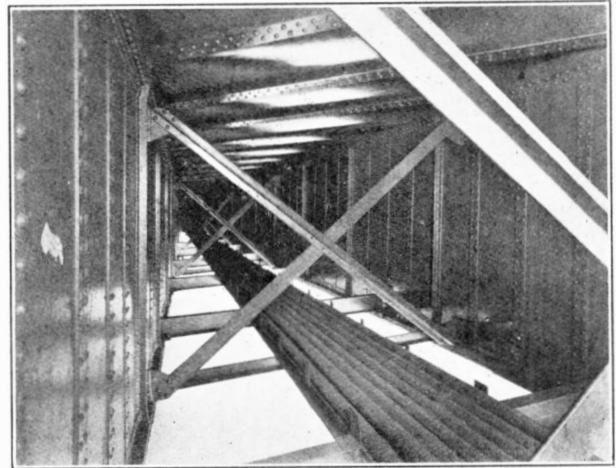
STEEL PIPES CROSSING PALATINE BRIDGE.
